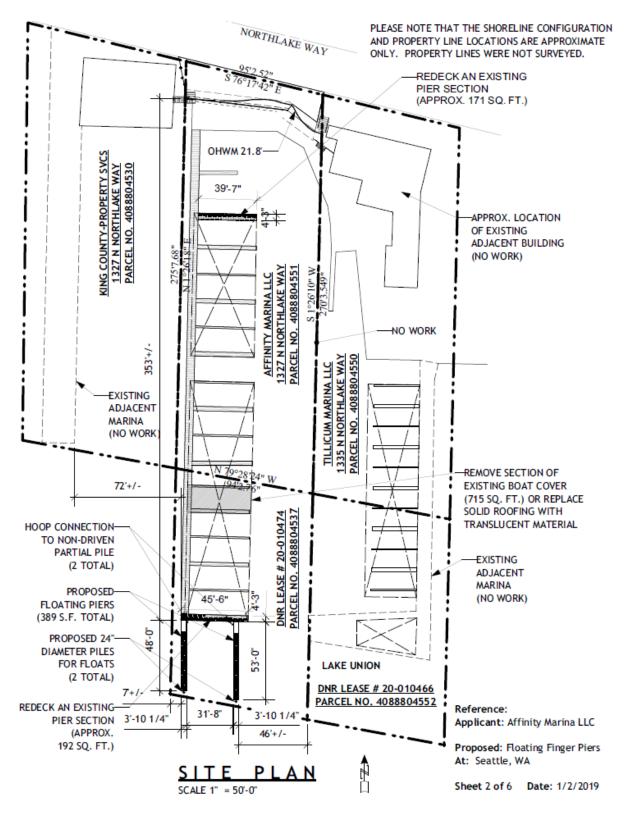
Aerial view of location of proposed floating piers, piles, sections of existing pier to be replaced with grated decking, and moorage cover to be removed.
